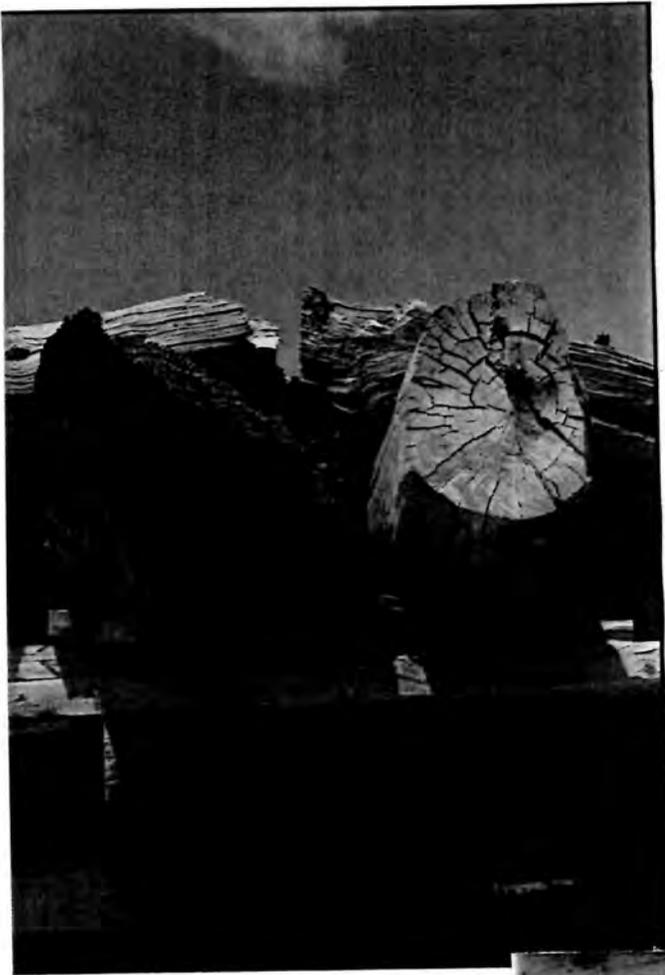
Looking west at the ridge beams and post. Note the separation of the roof at the top. Water is falling onto the logs at this point causing rot in the structure and wall members. (1998 photo)
